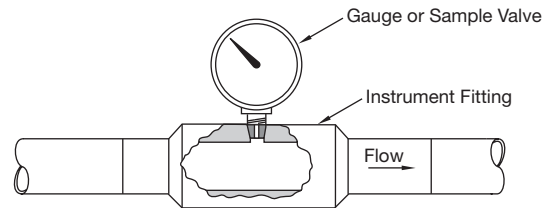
Proper use of instrument fitting to avoid dead space. Can be used with gauge guard.
